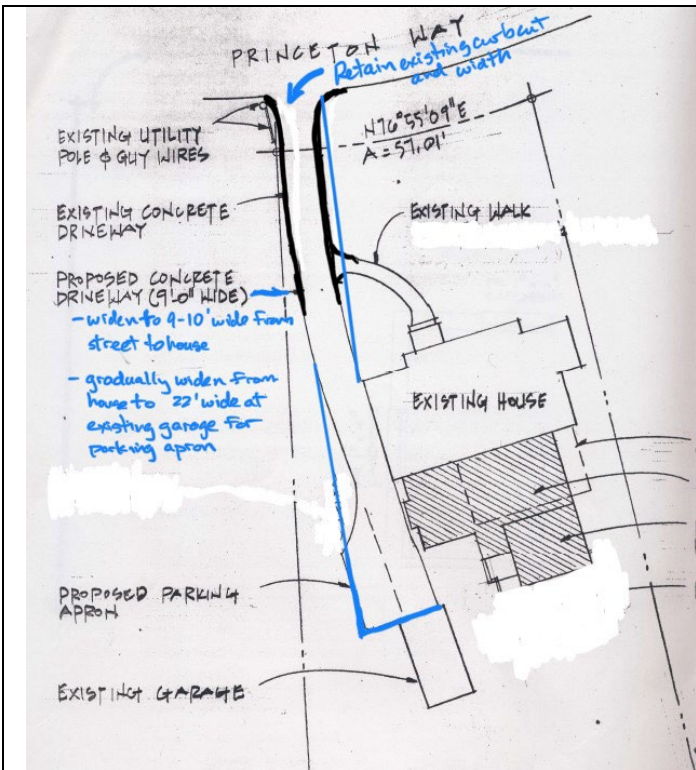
Proposed driveway replacement. Alterations from plan approved by DCHPC in 2009:
